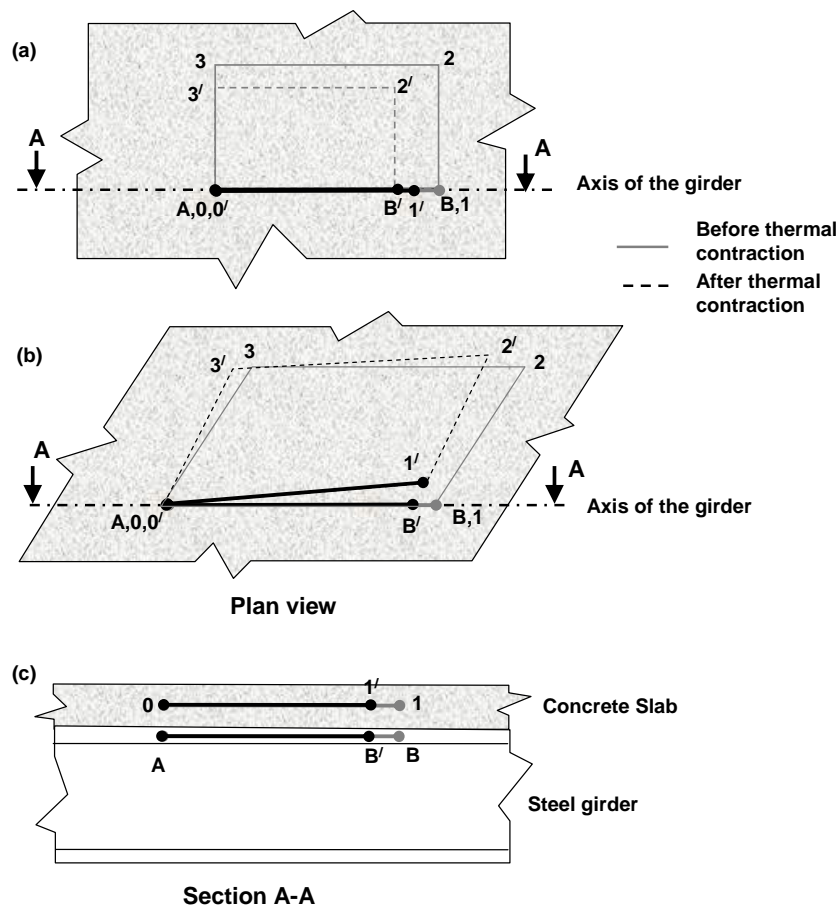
Movements of the girder and the slab due to unrestrained thermal deformations: (a) plan view of a rectangular slab; (b) plan view of skewed slab; and (c) Elevation of a section through the axis of steel girder.
